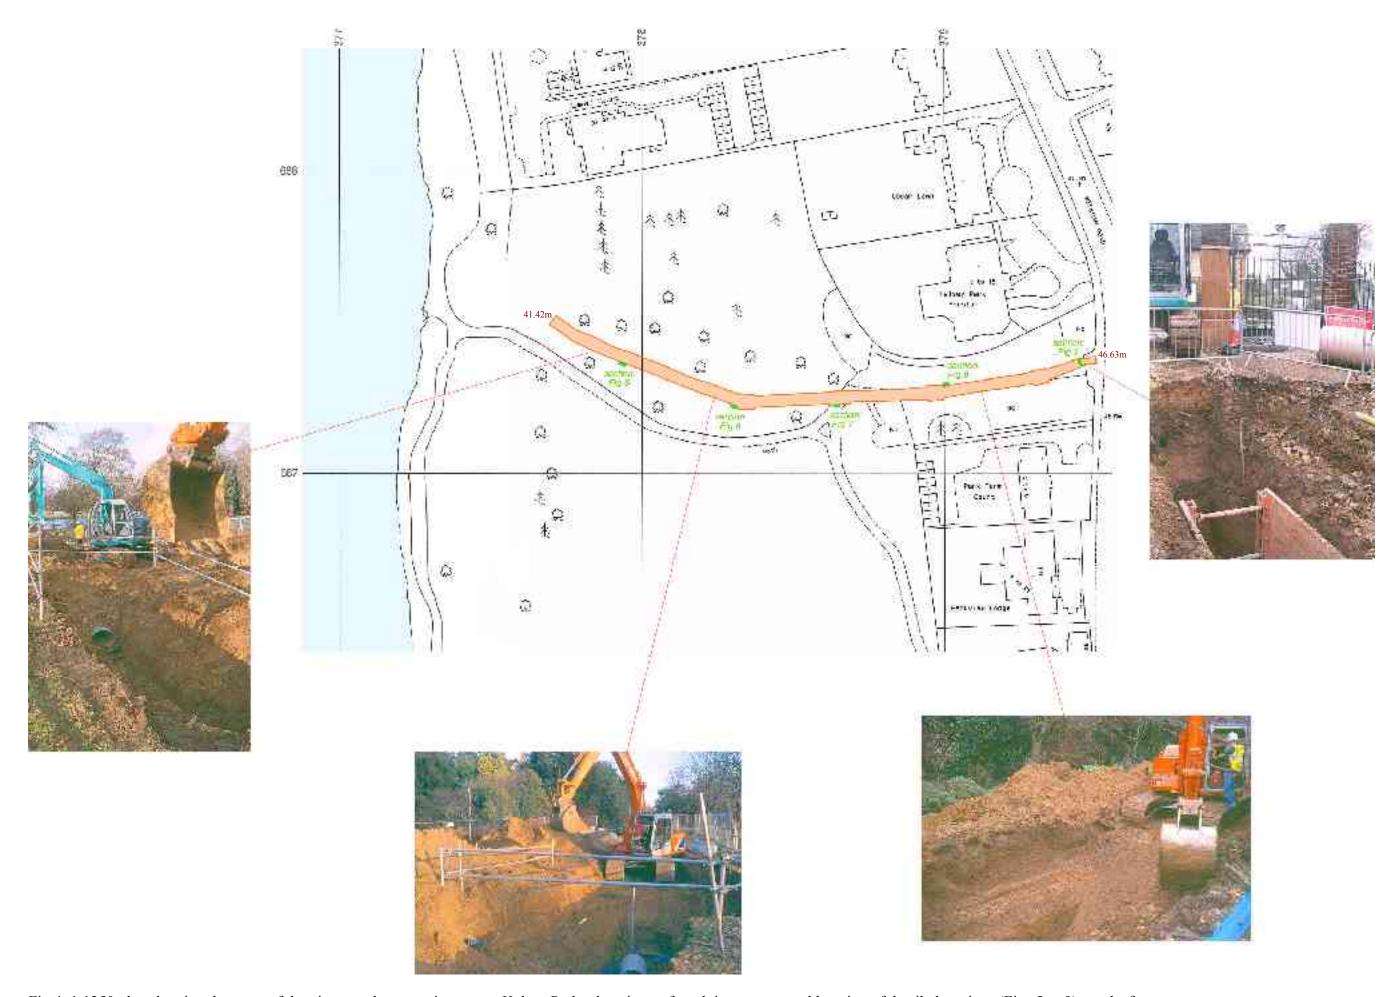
1:1250 plan showing the route of the pipe trench excavation across Kelsey Park, plus views of work in progress and location of detailed sections (Figs 5 to 9) overleaf
